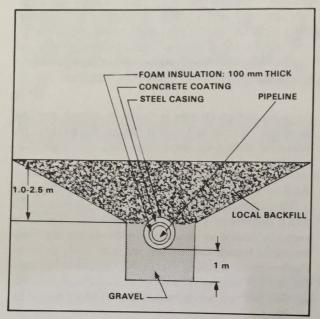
A typical pipeline cross-section at a shore approach.
